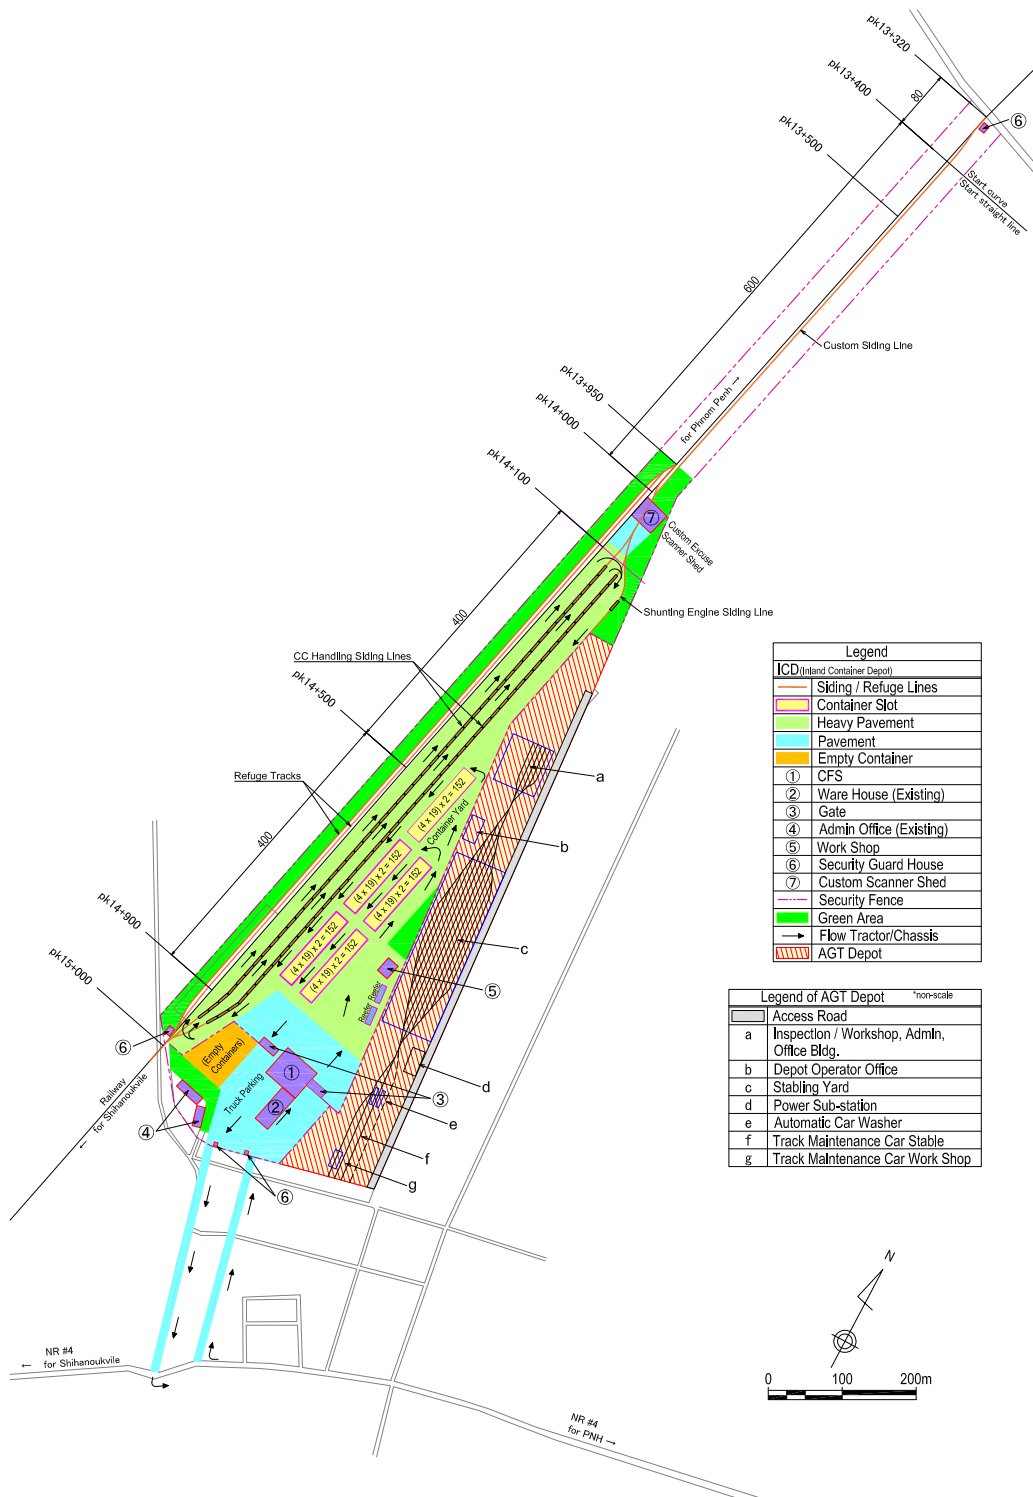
Layout Plan of Railway (South Line) ICD (PAS/RRC) at Pk14/15 km (for RS System)
